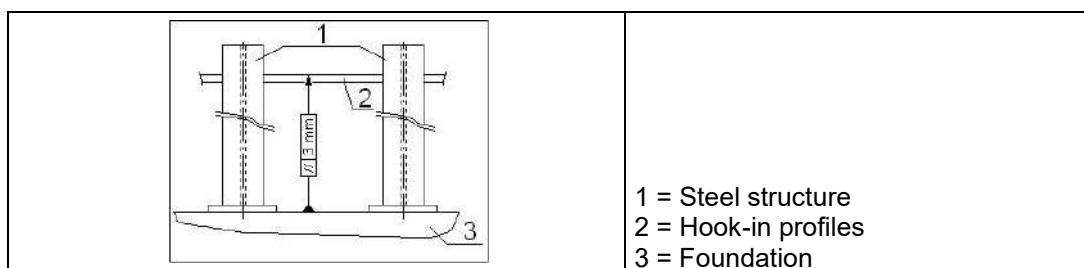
Floor profiles (permitted tolerances)
